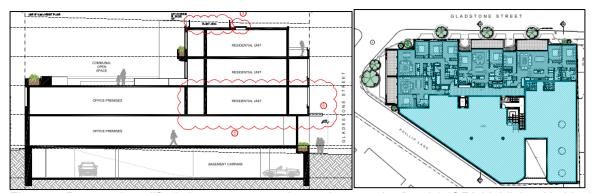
Proposed modified plans – cross section and mezzanine/level 1 (GFA highlighted in blue)
